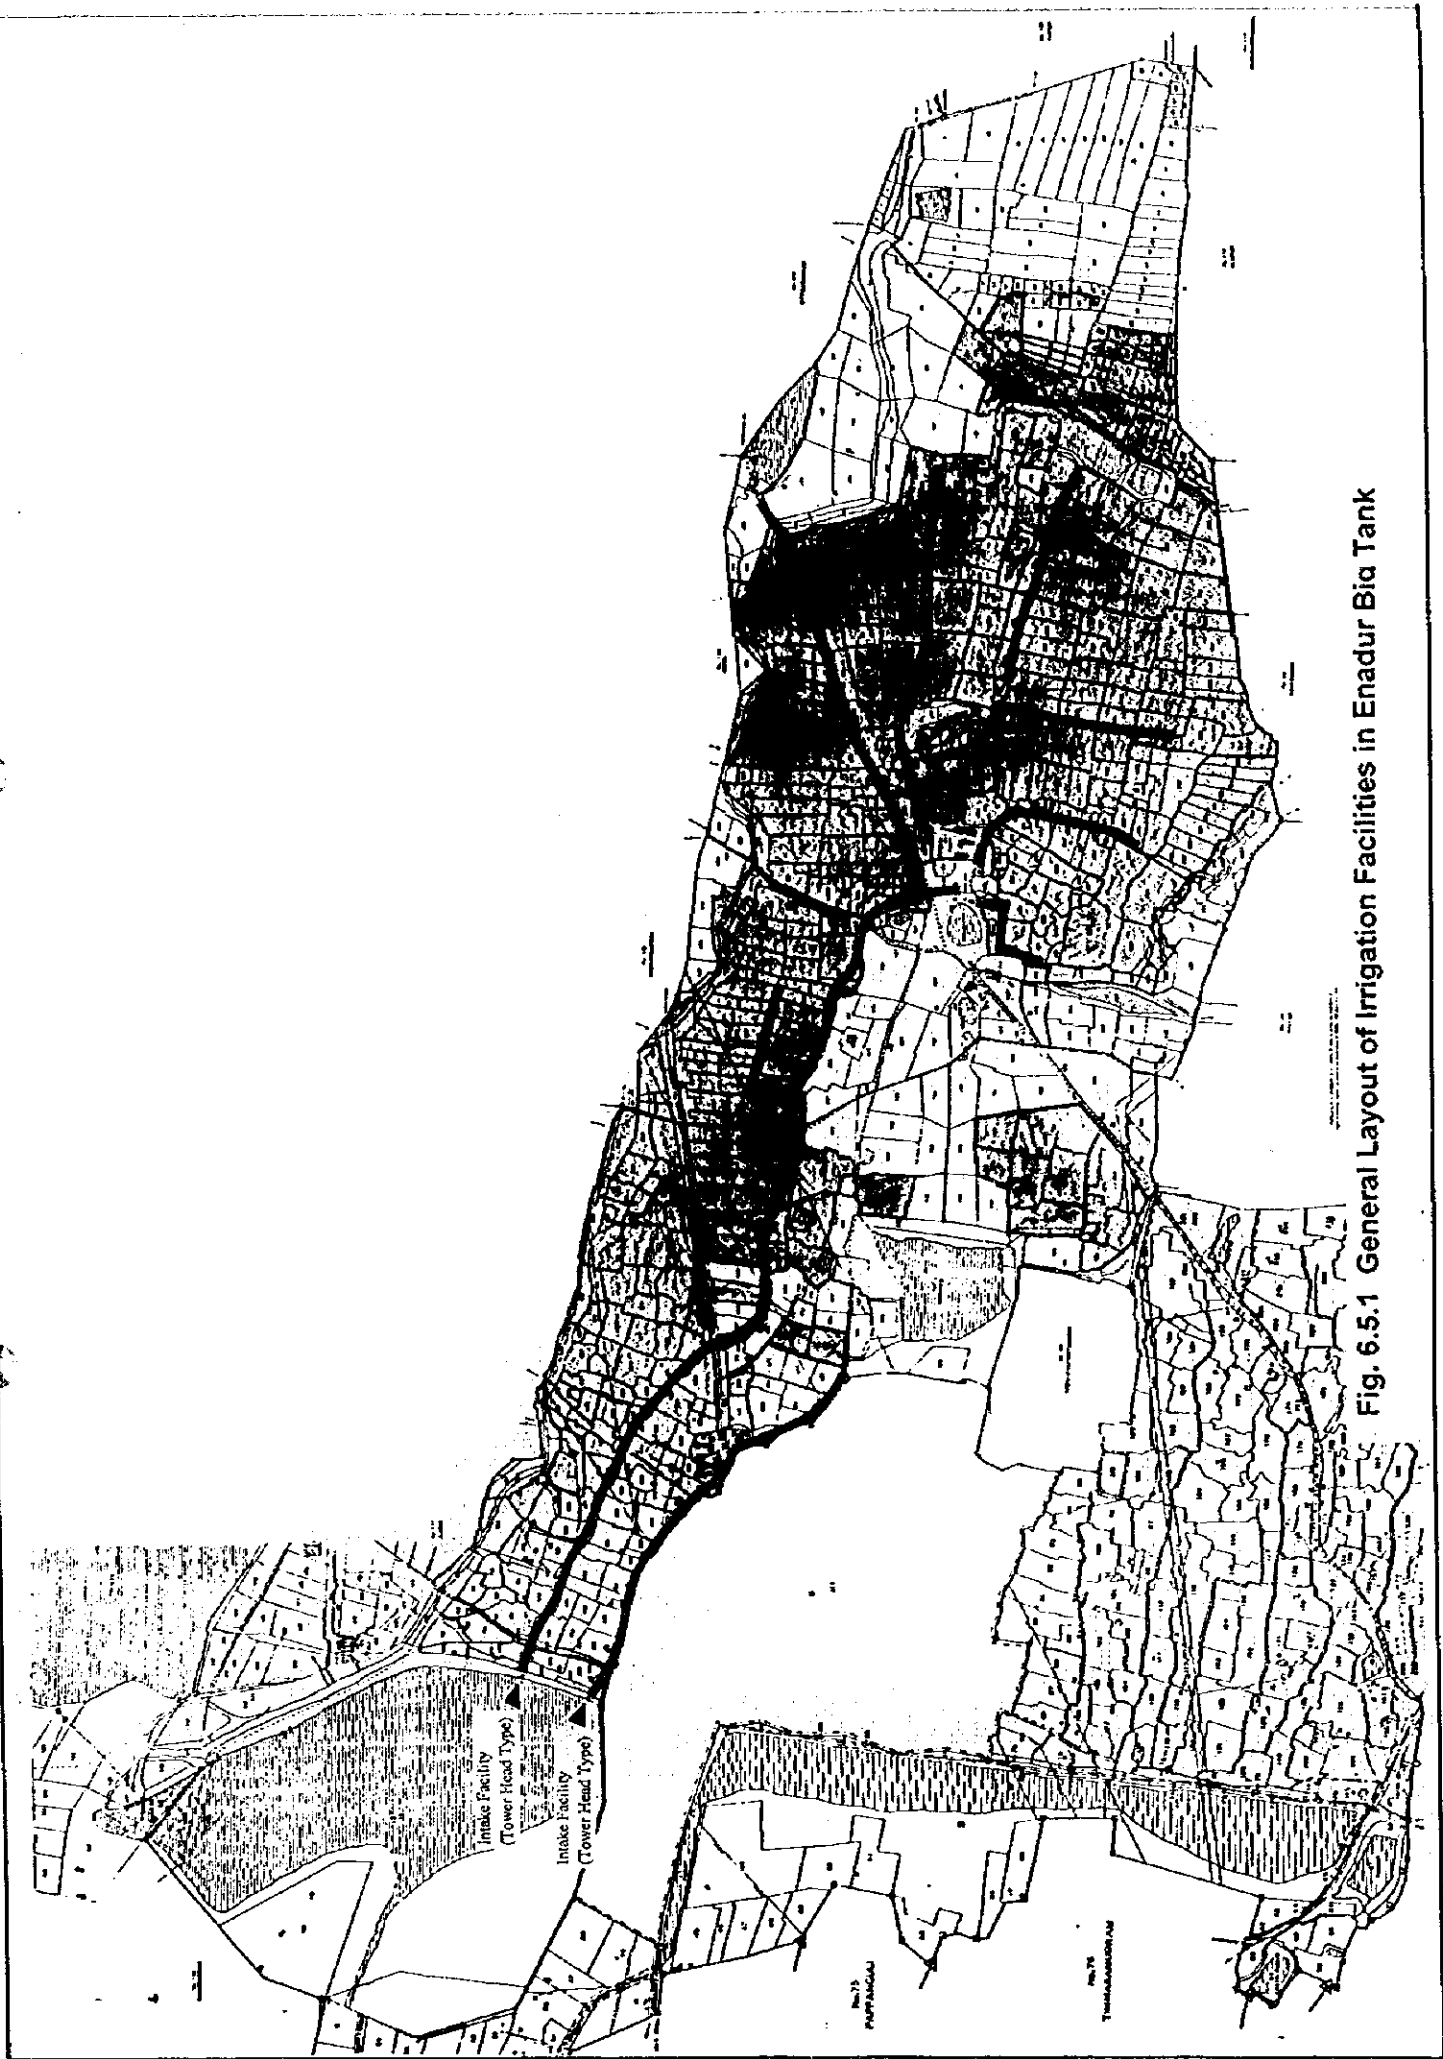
General Layout of Irrigation Facilities in Enadur Big Tank
